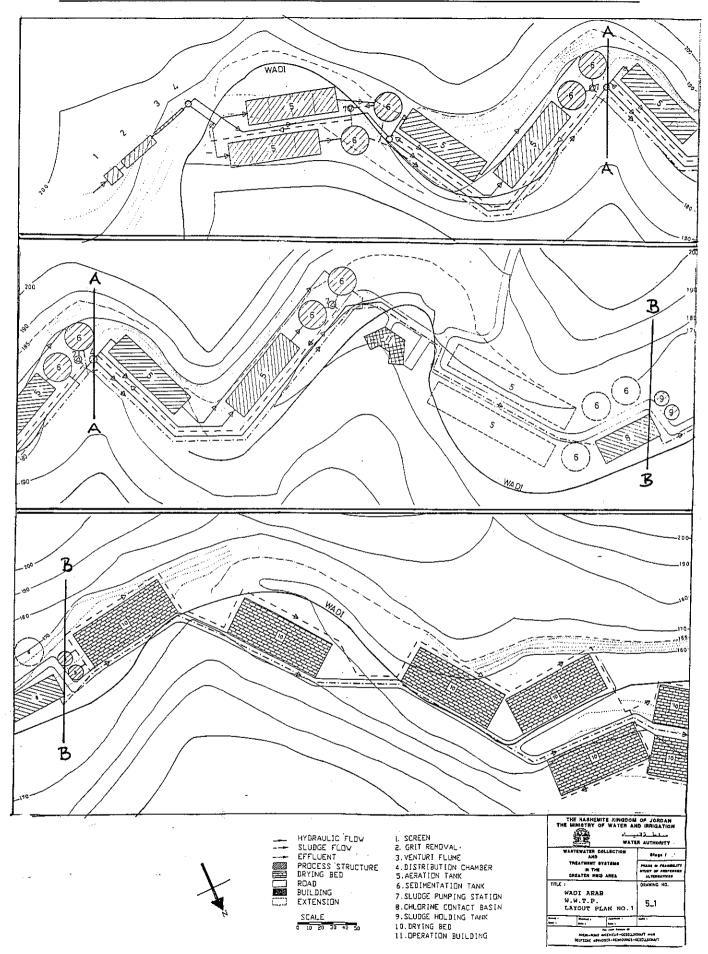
Schematic Layout of Existing Wastewater Treatment Plant - WADI ARAB
